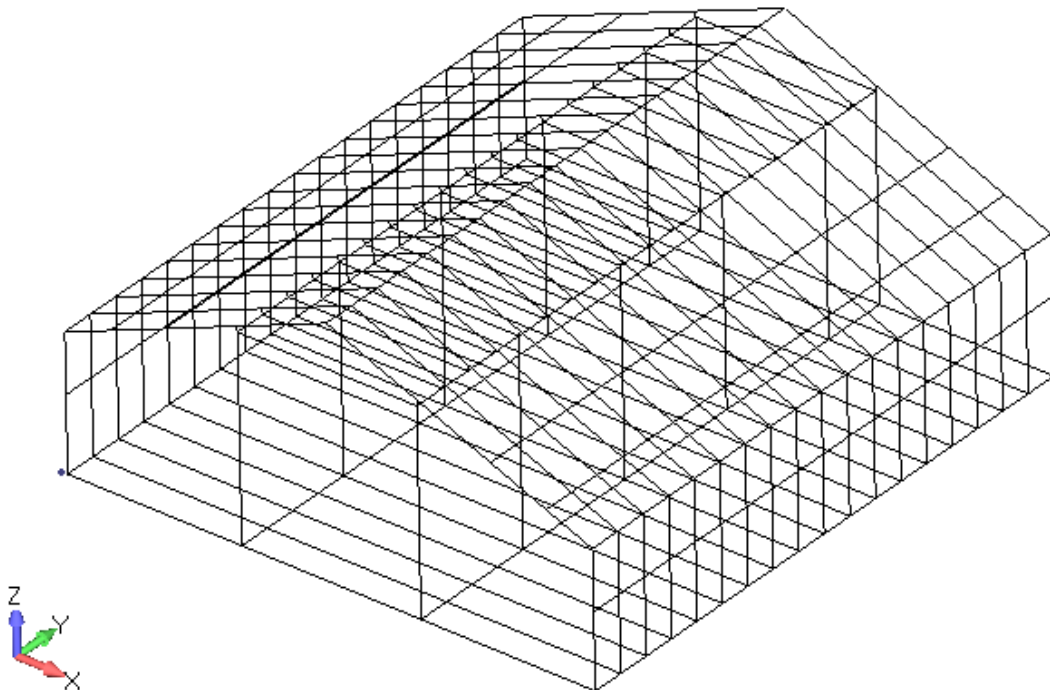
Finite element model of the building, studs spaced 2.5 m apart
